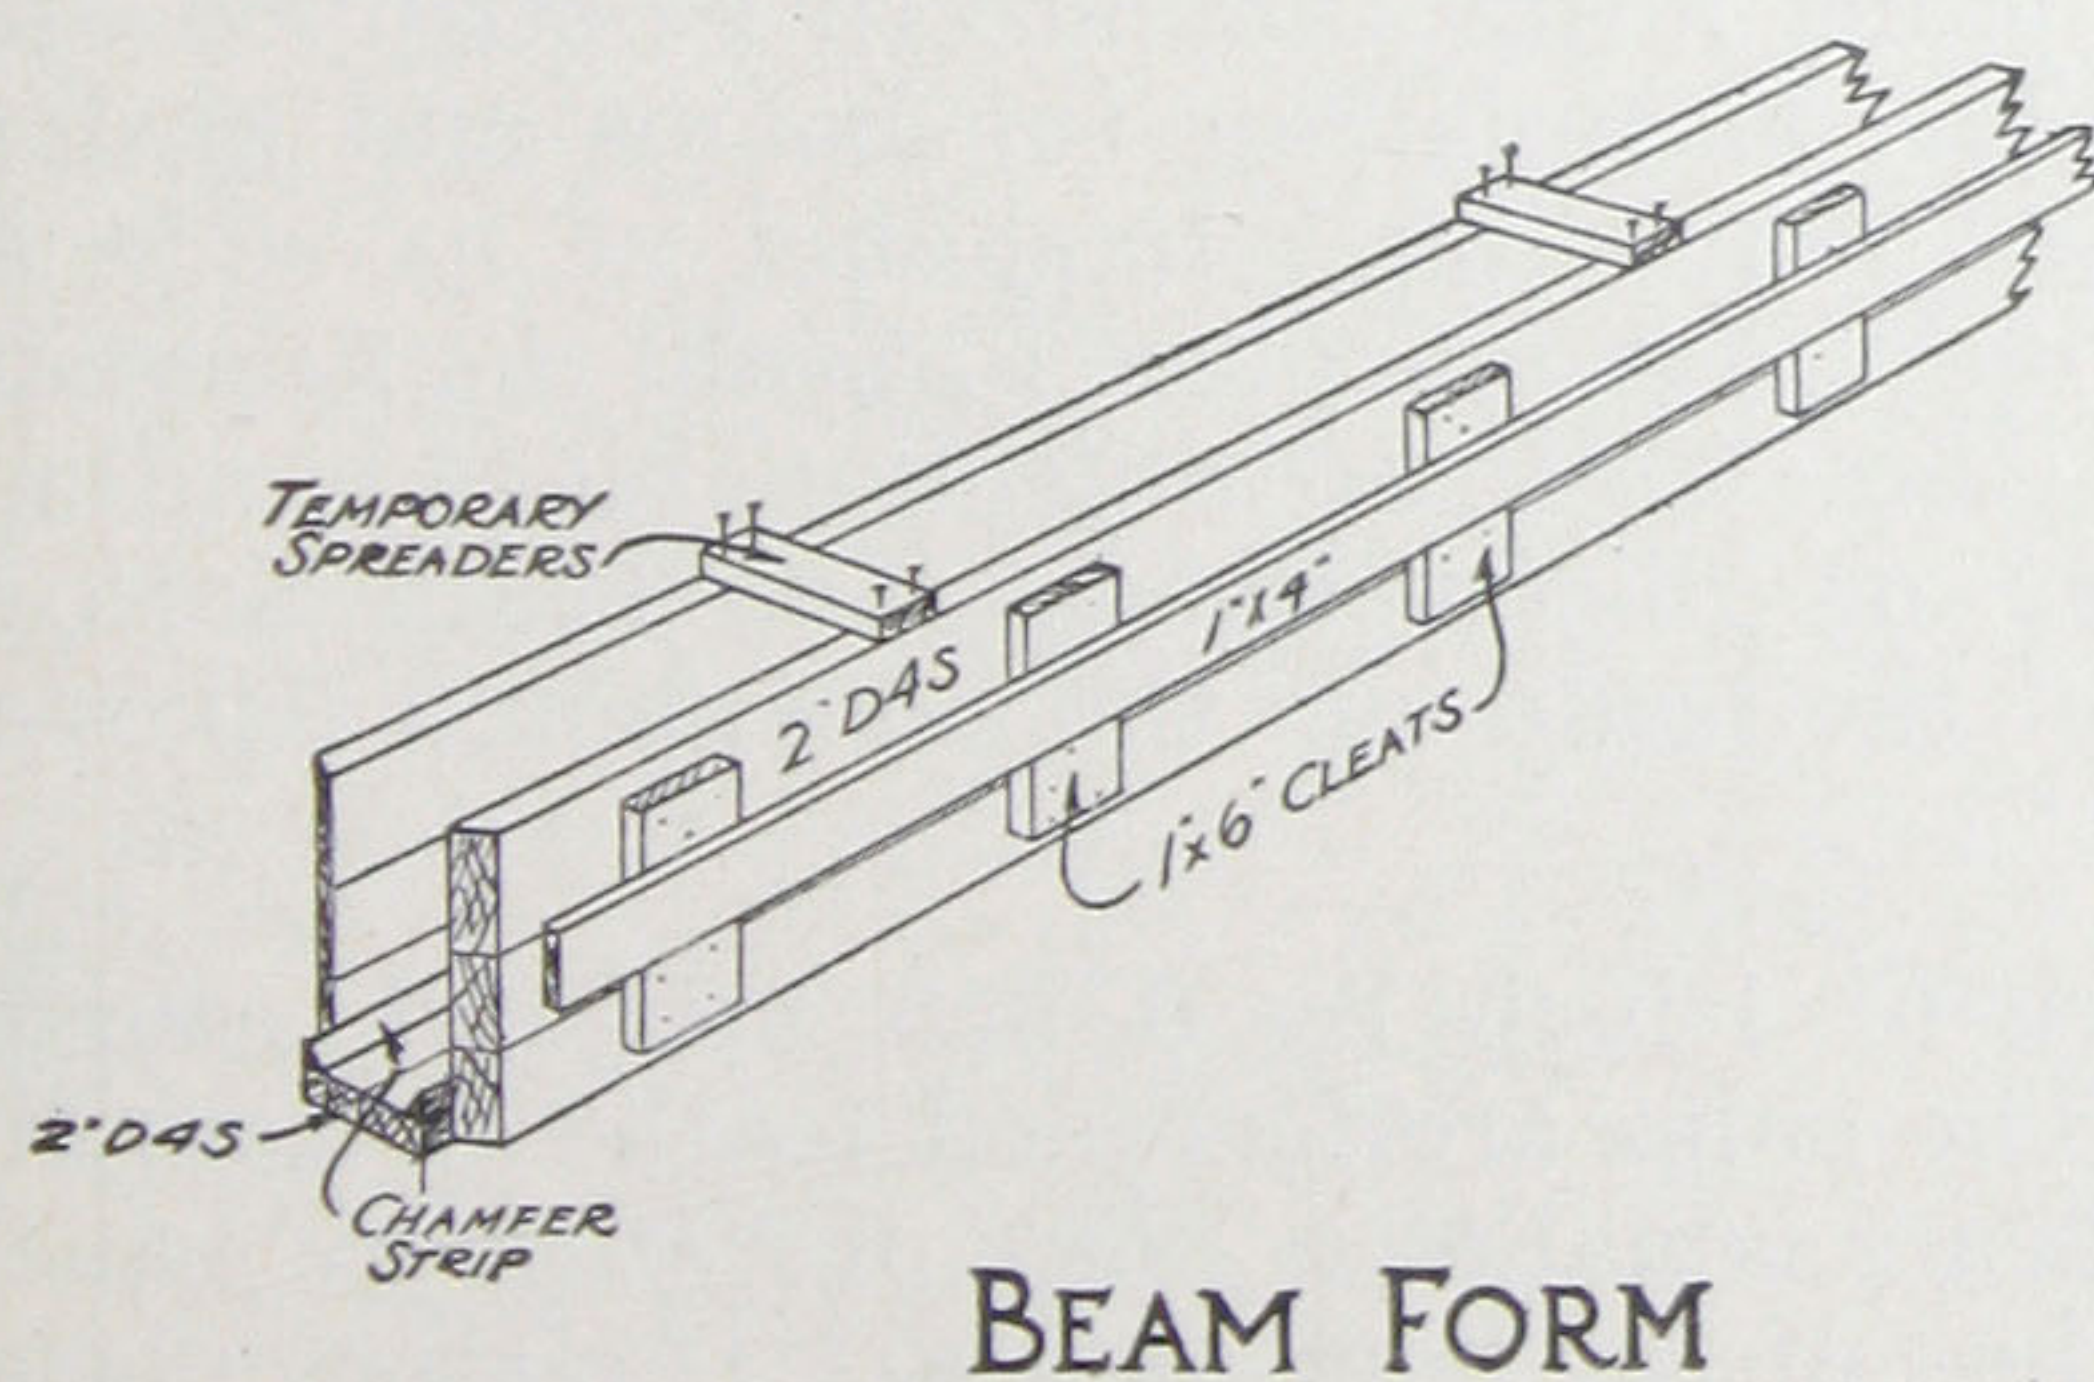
Beam and girder construction. Slab, beam and girder forms for use when the forms are removed as a unit. Figure 56 shows these forms assembled.
